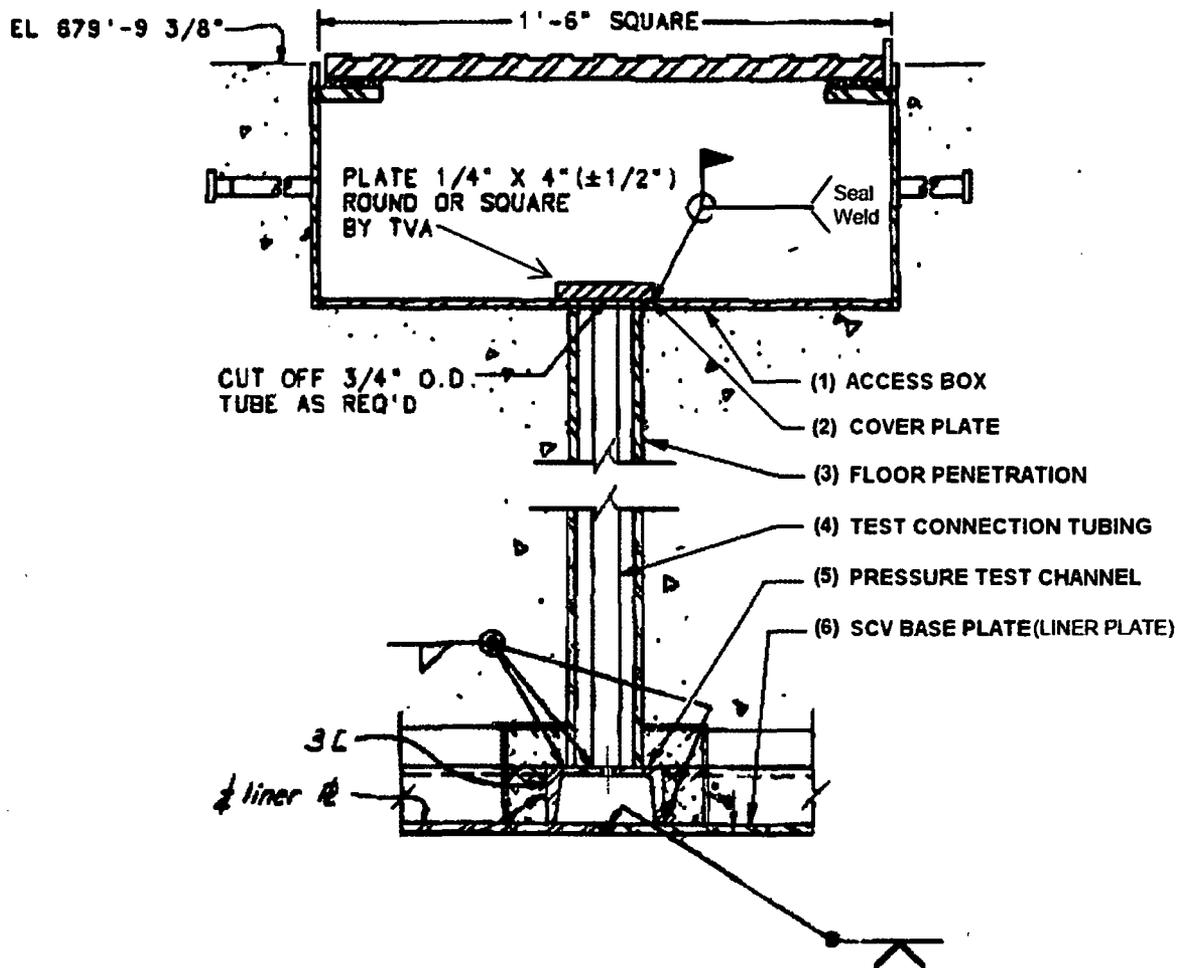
EXHIBIT A: TYPICAL TEST CONNECTION DETAIL
